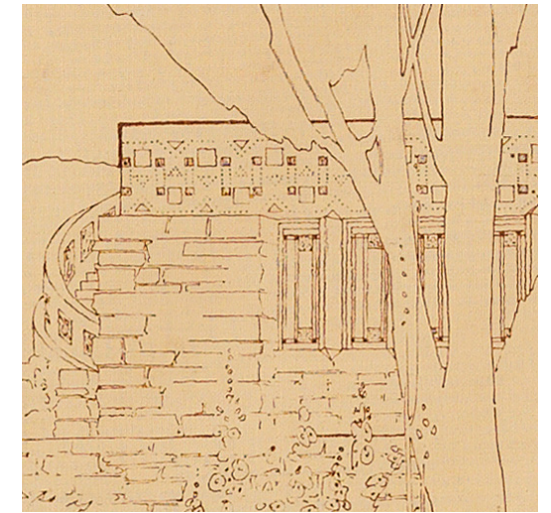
Detail of geometric pattern, profiled window sill and stained glazing
